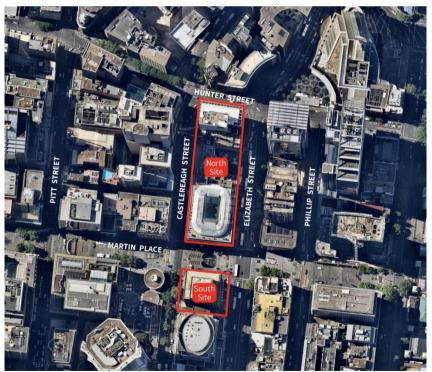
Aerial Photo of the North and South Site of the Martin Place Metro Station Precinct
